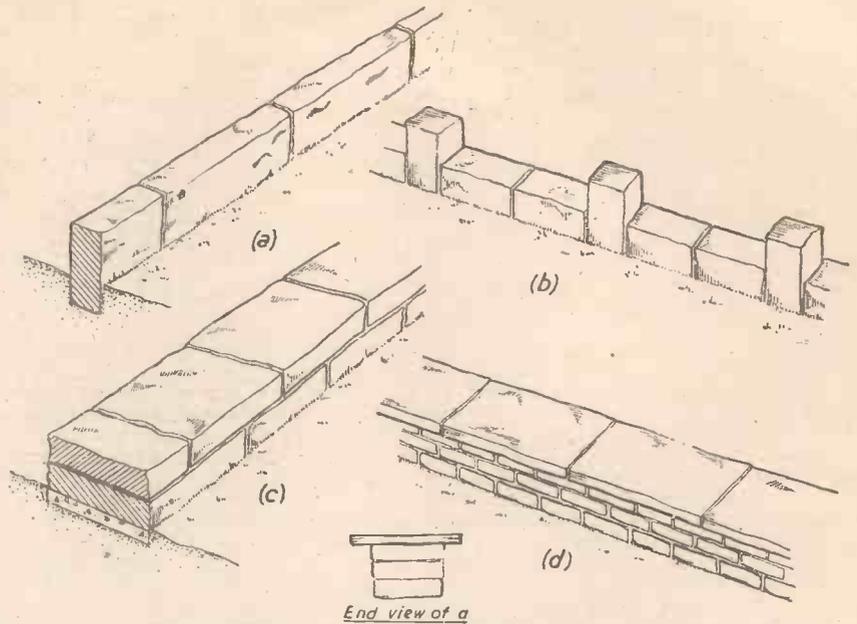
Showing how small concrete slabs can be used for garden edgings.
